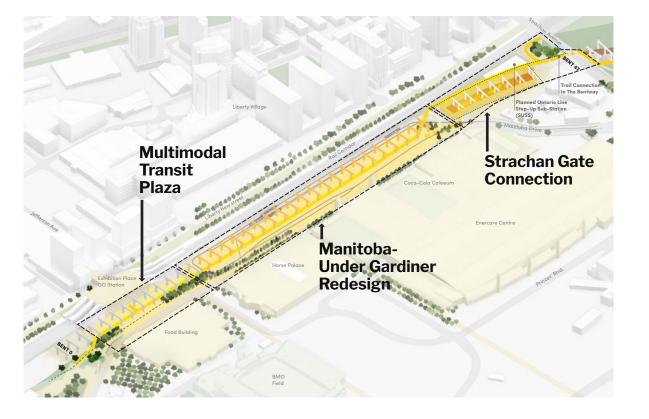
Conceptual plan for the Exhibition Place West Anchor district
